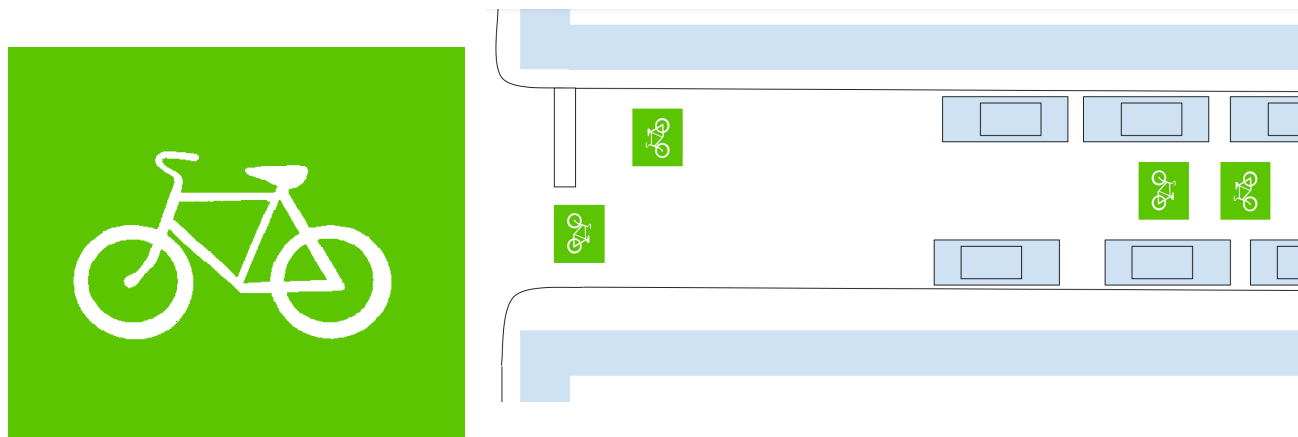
Potential Local Street Bikeway pavement marking and suggested locations
